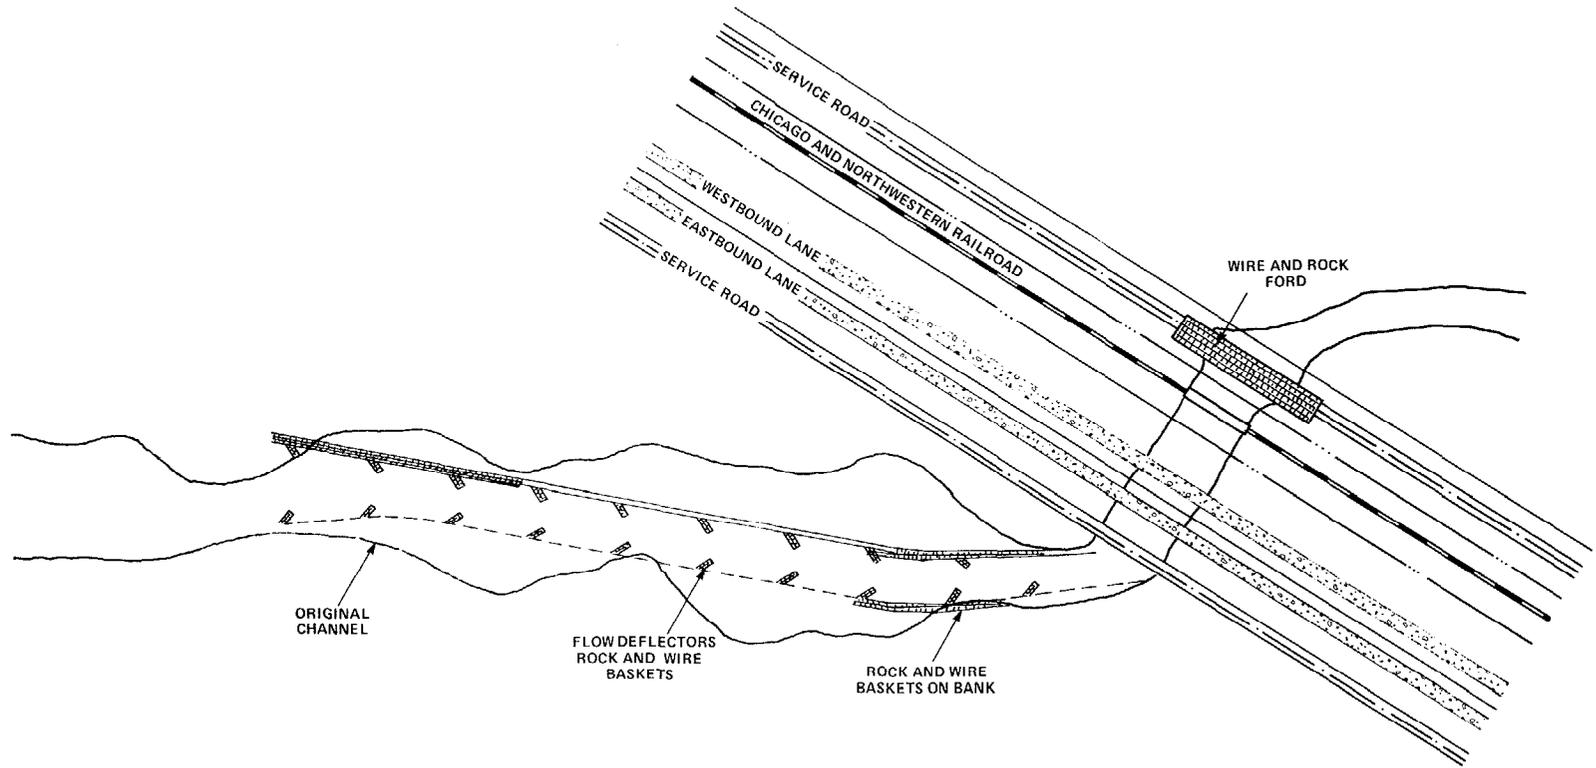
DEFLECTOR ARRANGEMENT AND ALIGNMENT PROBLEM ON I-90 BRIDGE
